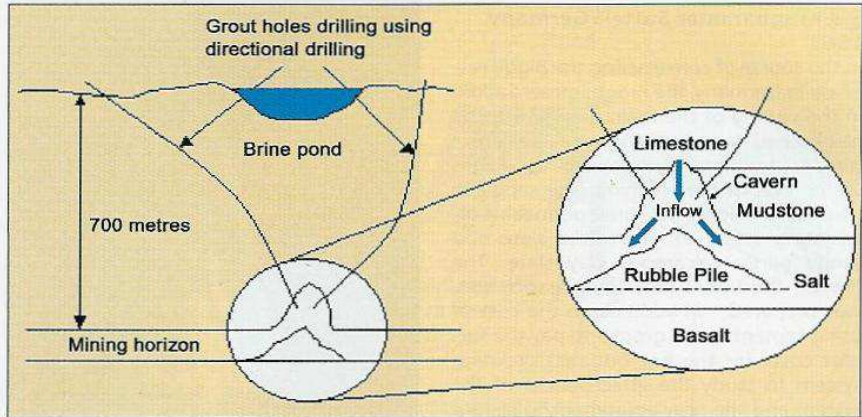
Schematic diagram of the grout hole layout at the potash mine
